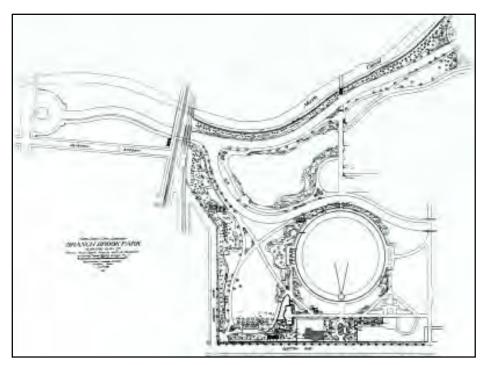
Planting Plan from Eighth Avenue to Reservoir and along Canal Bank, Southern Division, Plan #2121-327, 6 October 1899. Source: ONHS.
